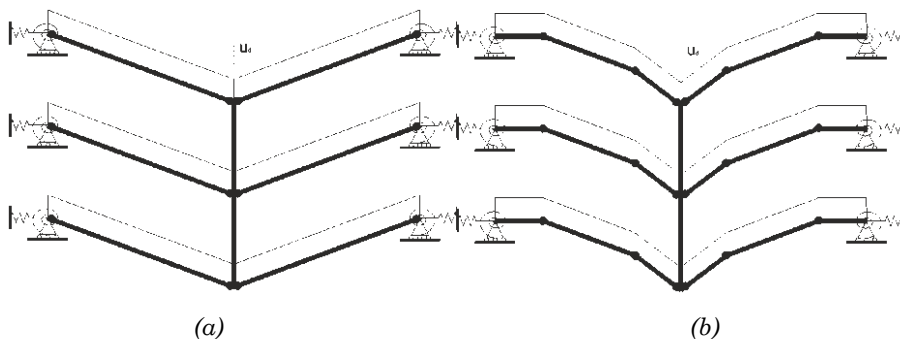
Collapse modes due to column loss in steel (a) and RC (b) frames
